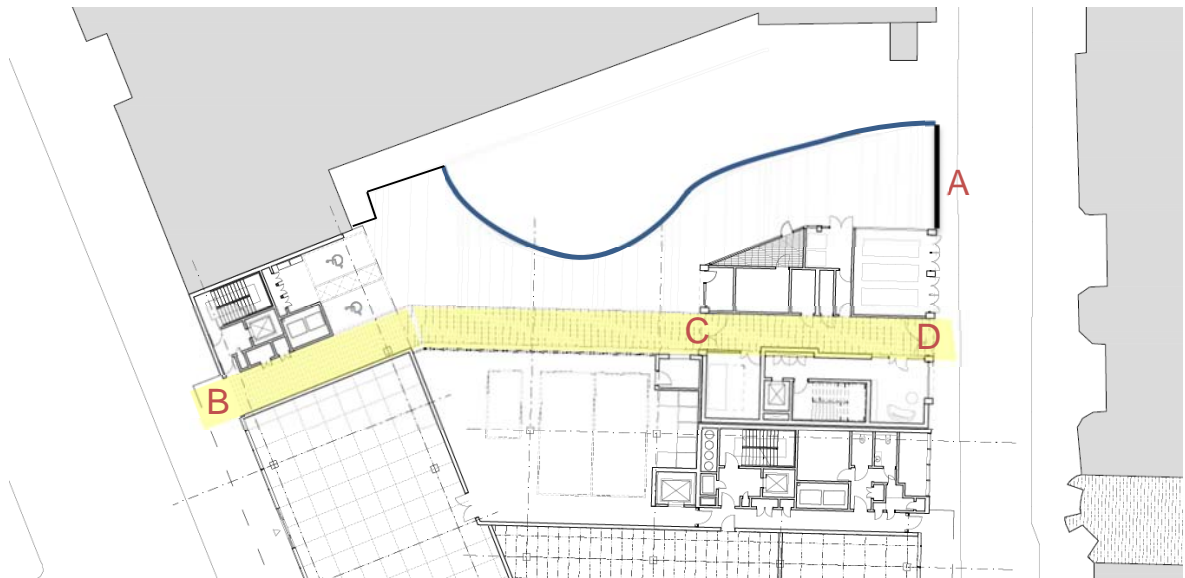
Excerpt from current Ground floor plan AFP 00 1 200 NTS
